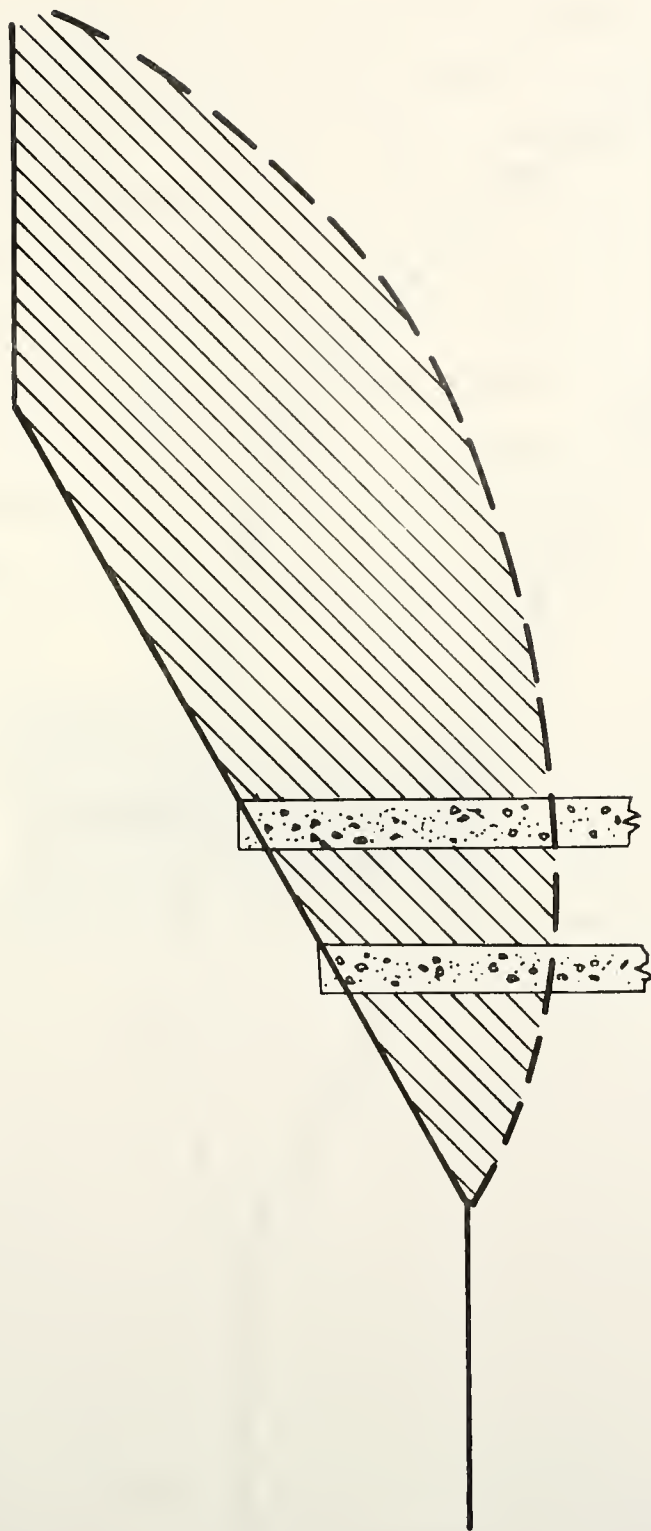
Reinforced Concrete Piers Used to Stabilize Slopes
